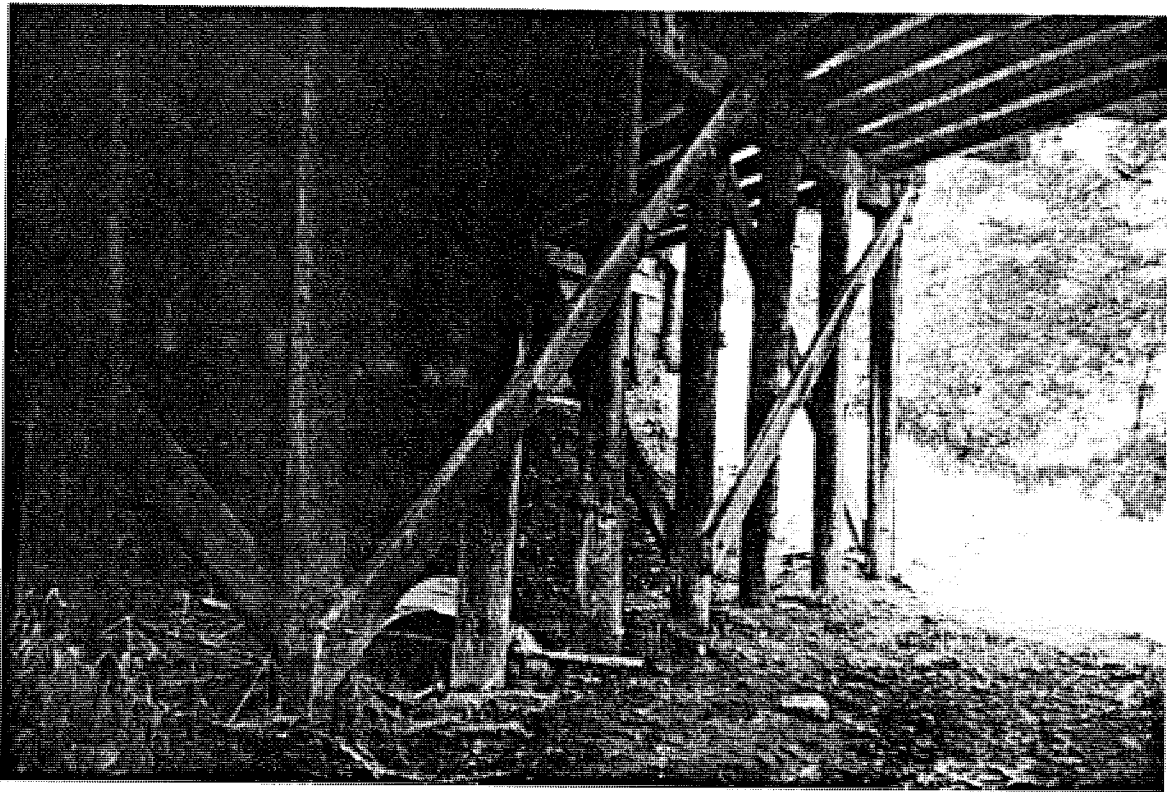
Photograph of Bridge No. 9798, Hwy 60, Minnesota.
